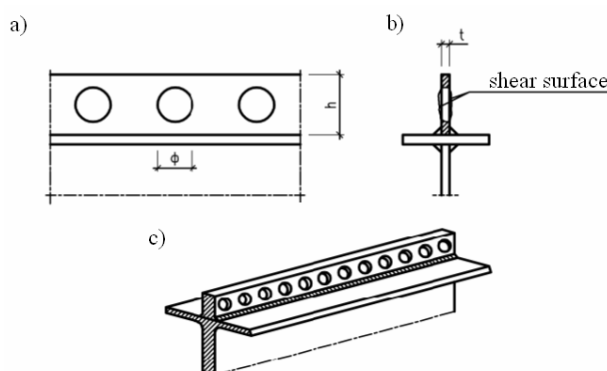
Strip connector: a – longitudinal cross-section, b – transverse section, c – general view
